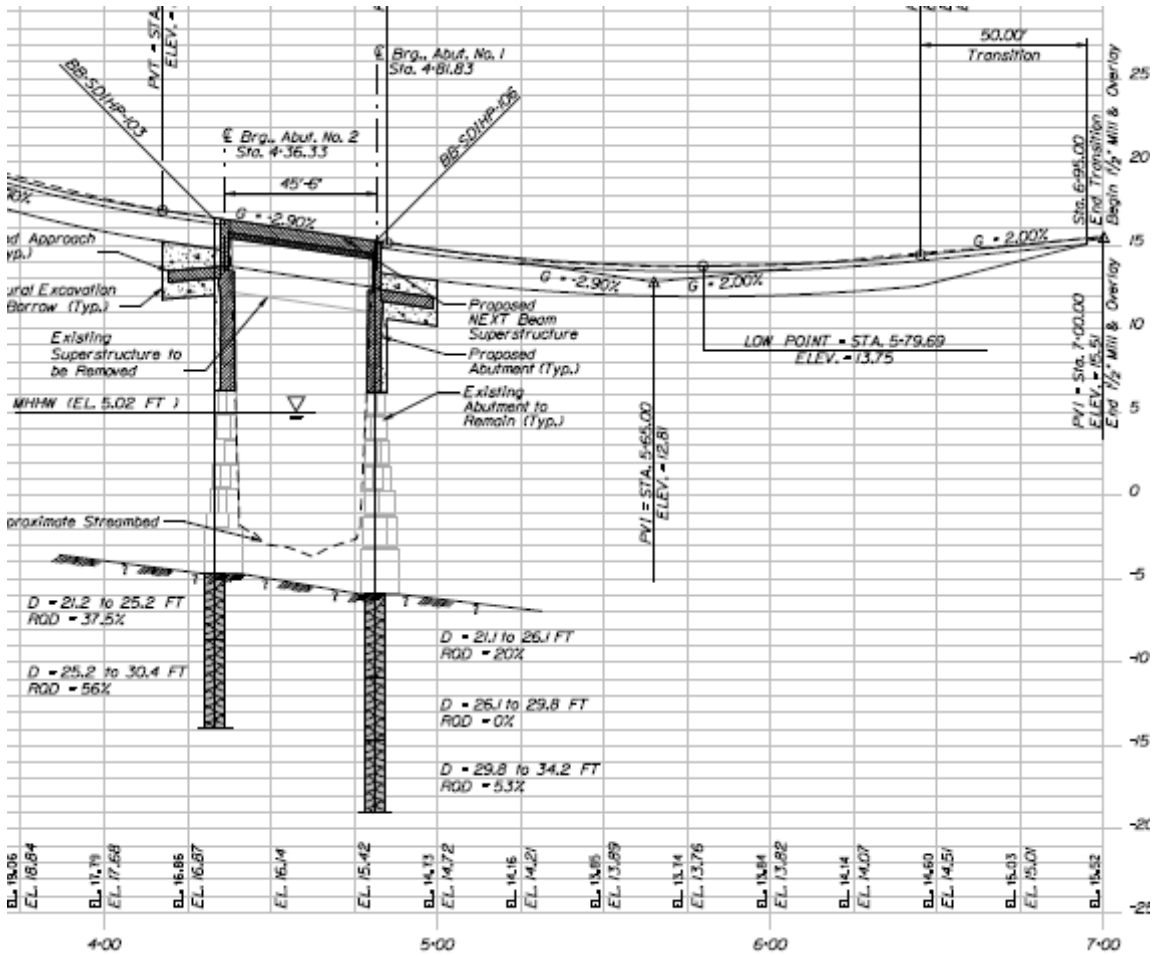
Plan B-2, Interpretive Subsurface Profile, 2019-09-18
